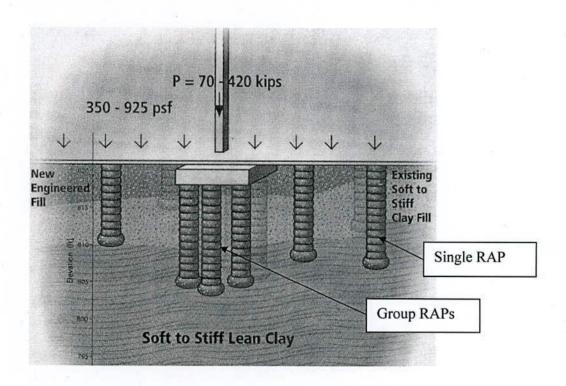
Section of single or double and group RAP (After Geopier 2006)
